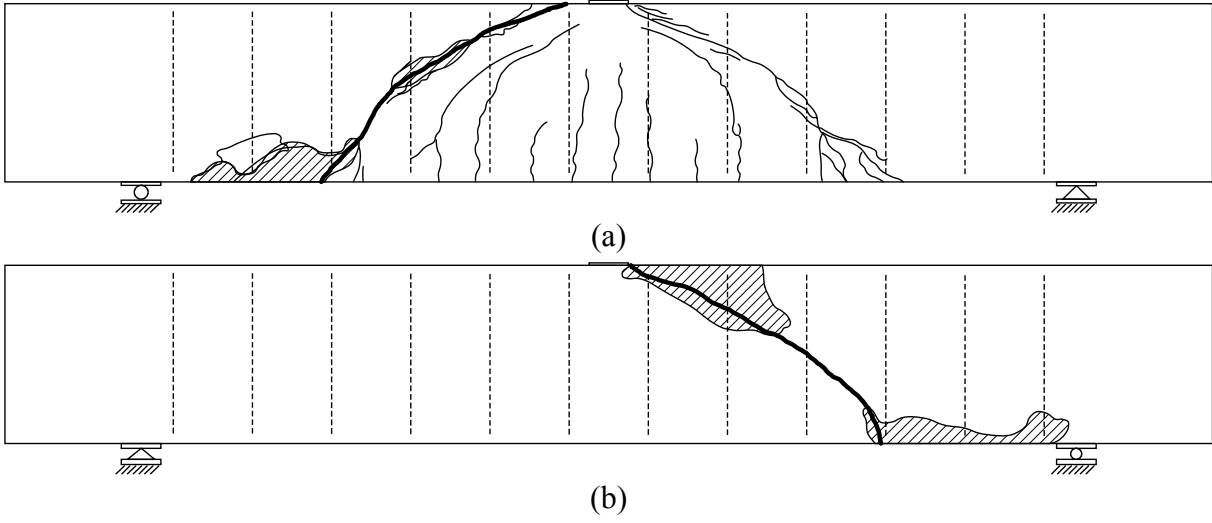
Observed damage in specimen P1S16, (a) front side, (b) back side
